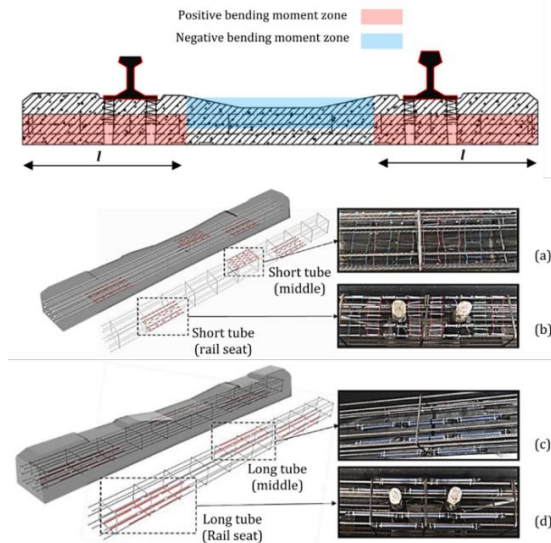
Capsule configuration within concrete railway sleeper: (a) short tubes at middle, (b) short tubes at rail seat, (c) long tubes at middle, and (d) long tubes at rail seat of sleepers [100]
